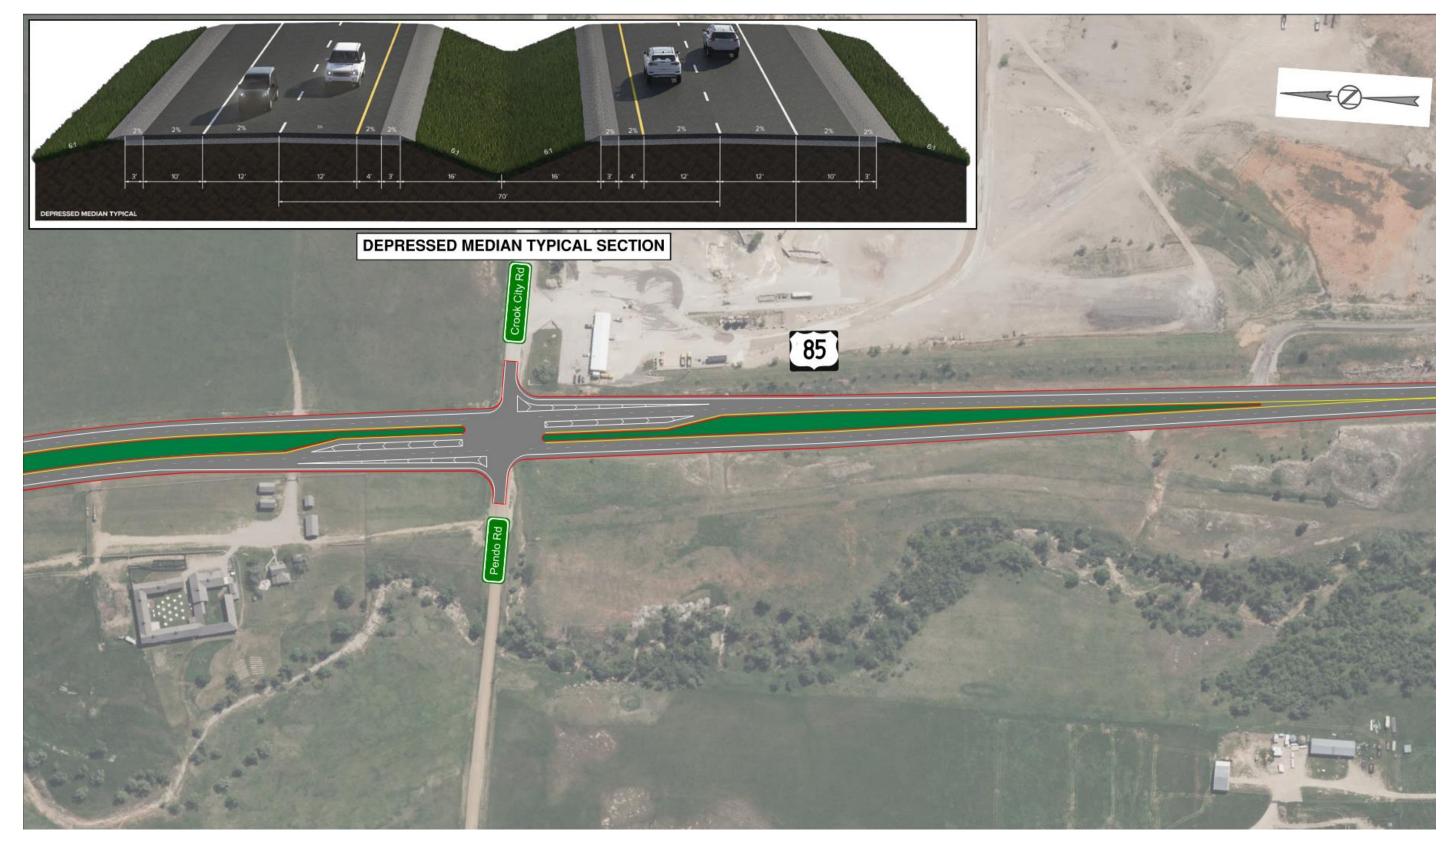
Alternative I1 – Extend Existing Typical Section to Crook City Road/Pendo Road
